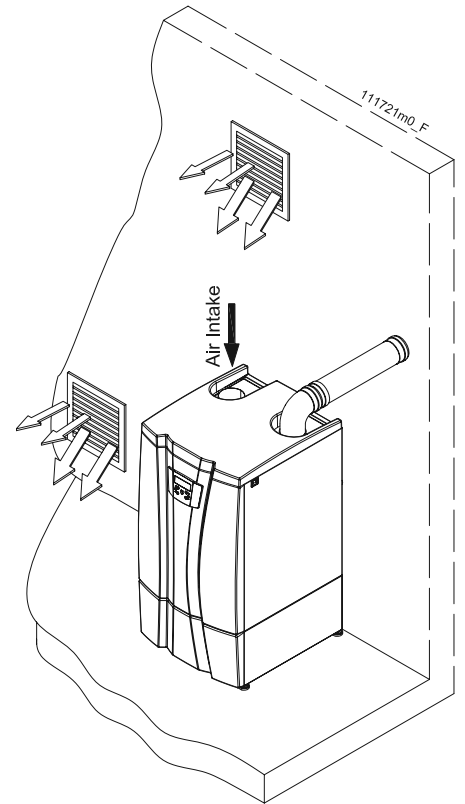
Side wall air intake, vertical vent (Direct venting).
